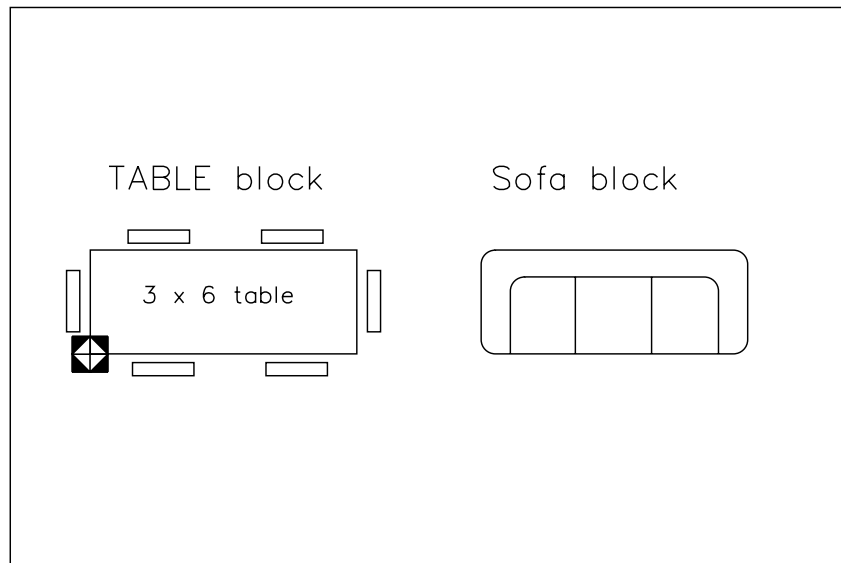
TWO BLOCKS IN MASTER DRAWING
